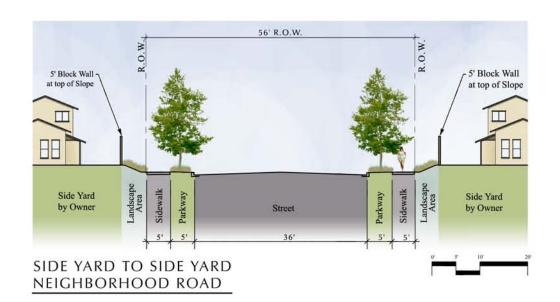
, *Interior Neighborhood Road and Private Drive Streetscape*, provides streetscape improvements for interior neighborhood roads and private drives ranging in width from 35-56 feet. Private Drives are also planned as access to low-density residential lots that face Briggs Road, Menifee Road and Mountain Avenue. Figure 5-45, *Interior Streetscape at Utility Easement* depicts the interior streetscape along the Southern California Edison easement at Planning Areas 20A and 20B. Figure 5-46, *Interior Streetscape along Park / Open Space* depicts the interior streetscape along the greenbelt in Planning Area 18A. Figure 5-47, *Interior Streetscape along Detention Basins* depicts the interior streetscape along the detention basin in Planning Area 22D.
